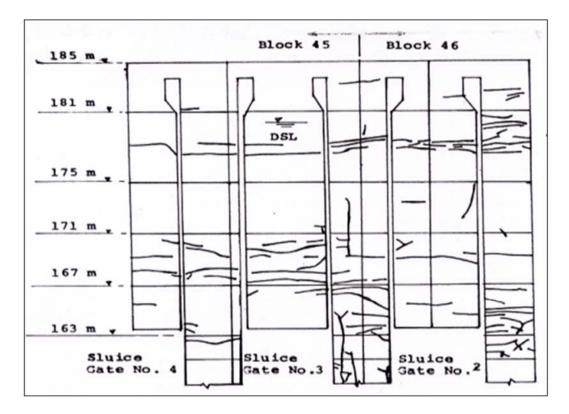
Spillway section and cracks on upstream face underwater of Hirakud dam
